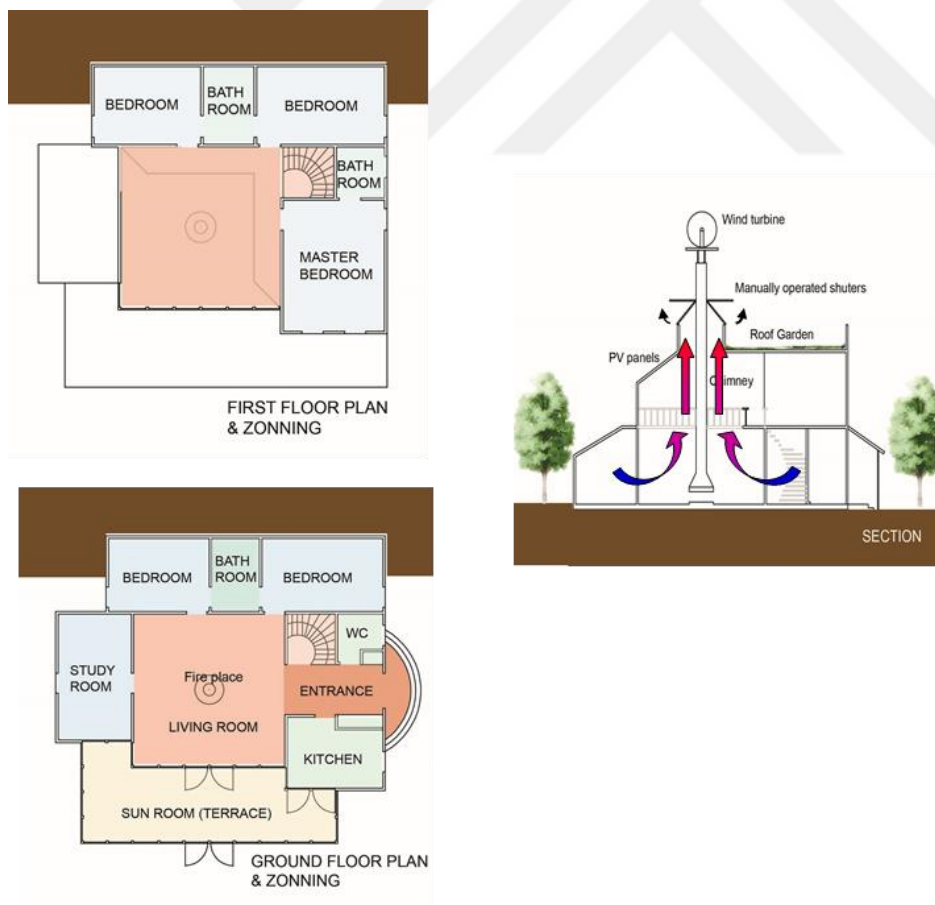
Hypothetical building floor plan with space usage and planning strategies.
